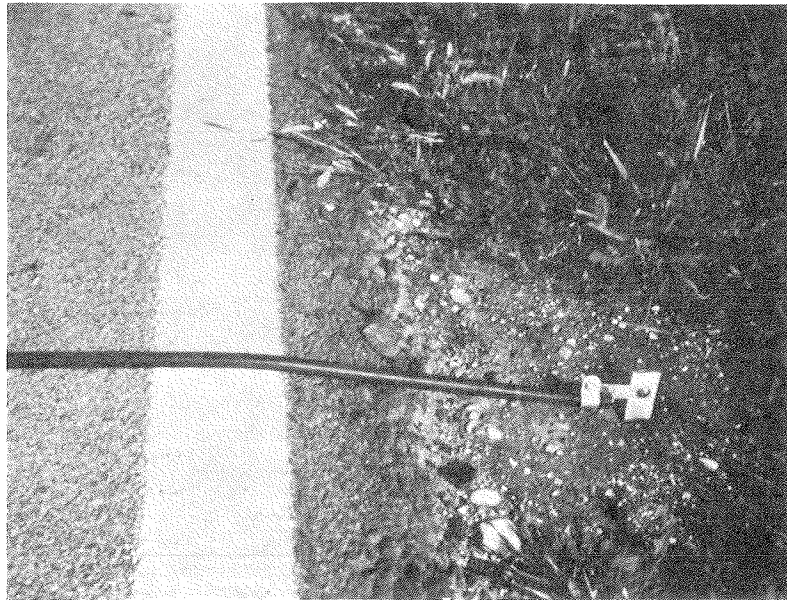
Detail View Showing Hose Clamp and Roadtube Anchored to an Iron-angle Stake Driven in Shoulder at Far-side of Pavement.
